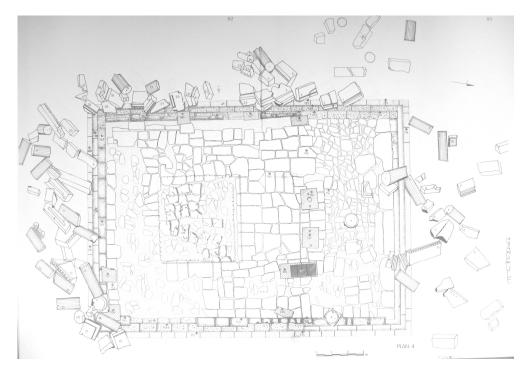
Plan layout of temple (Archeological excavation reports)
